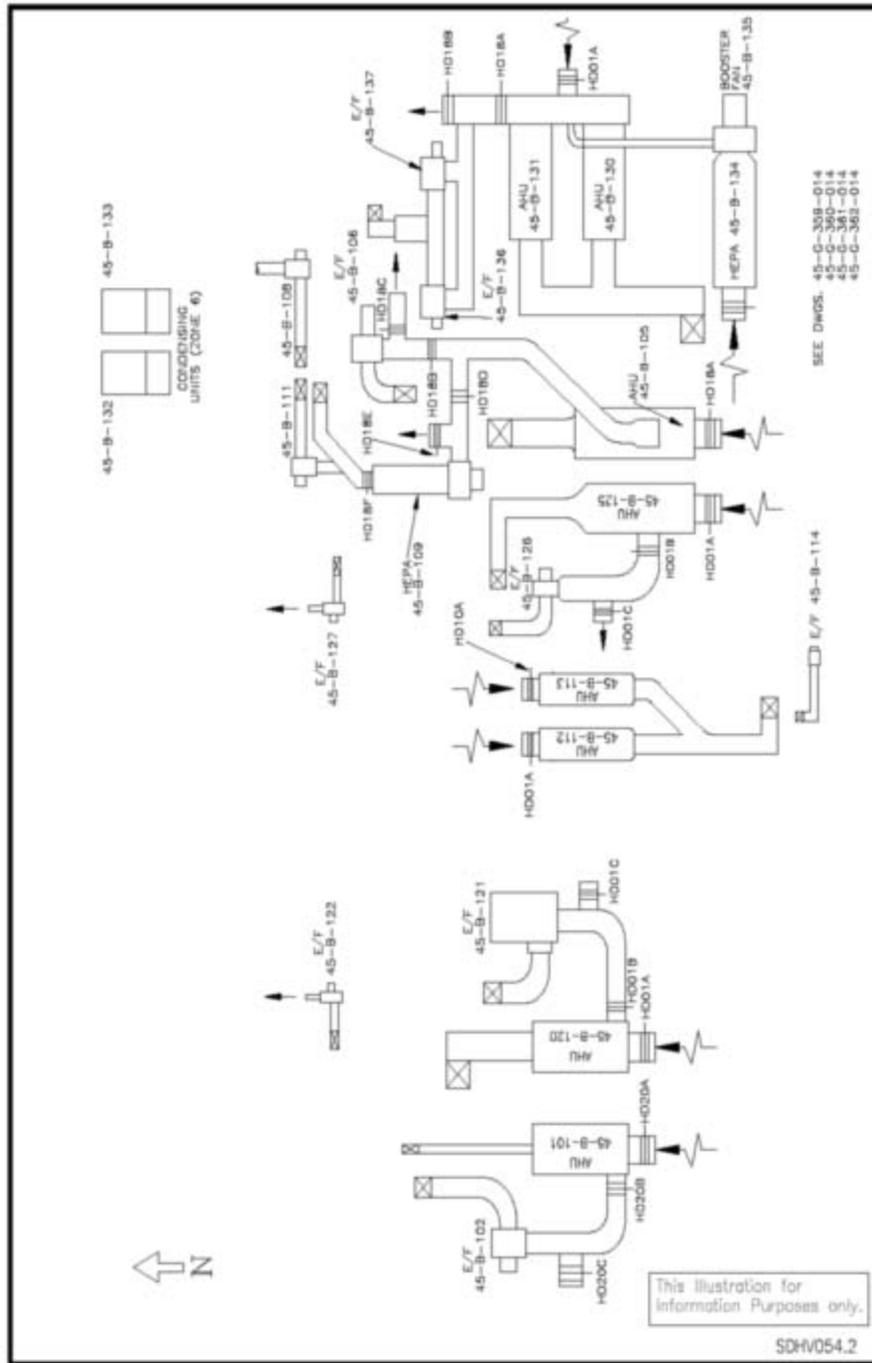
Layout Plan of HV03 Components on Roof of Support Bldg.
